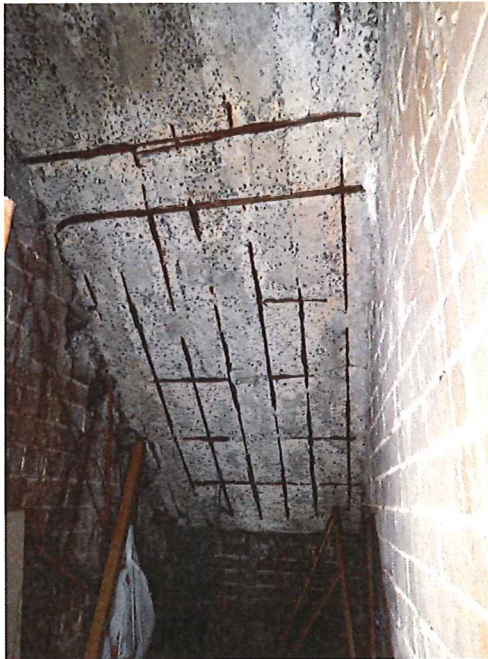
Severe concrete cancer to underside of stair at south western corner of building
